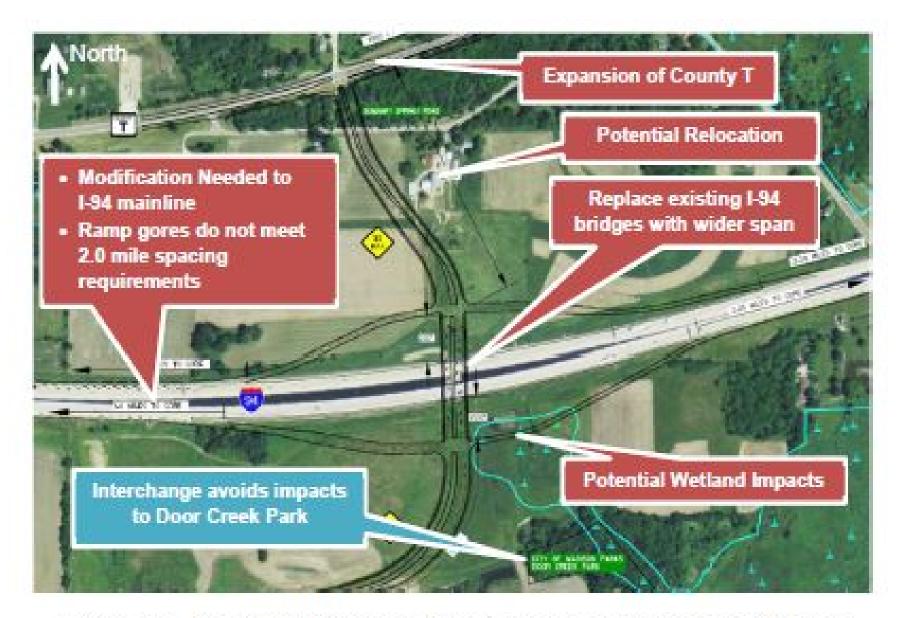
Potential Milwaukee Street Extension Alternative B Design
